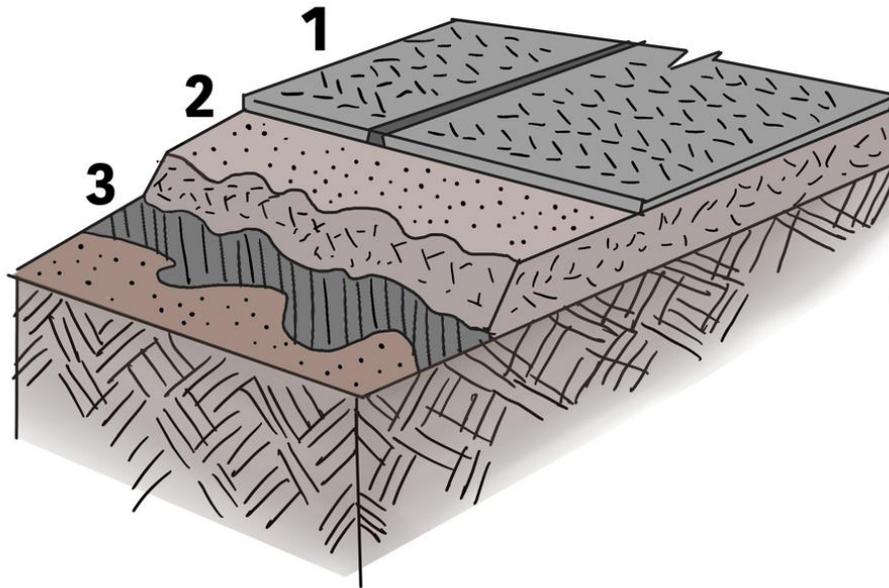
8 Matting detail 1) AlturnaMATS® or other durable and protective surface covering 2) Six inches of wood chips or mulch, 3) Geotextile fabric (adapted from Urban, 2008).
